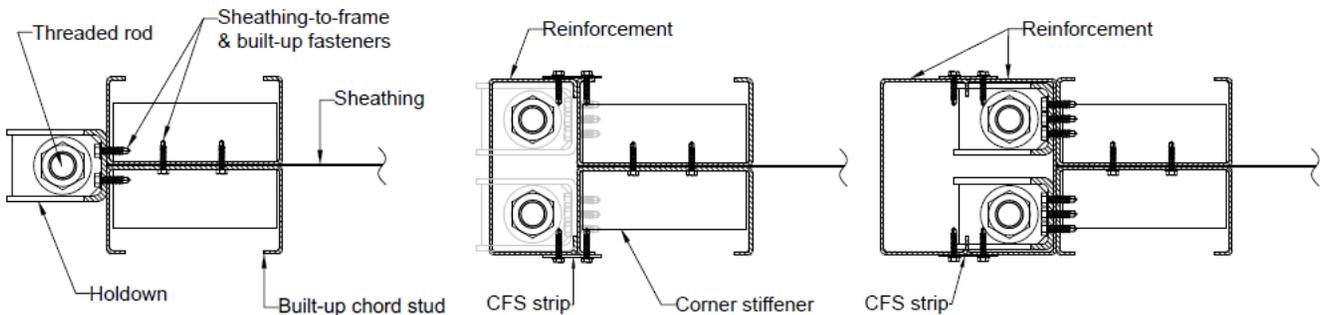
Left to right : no reinforcement, R2, and R3 reinforcement schemes for the chord stud members
